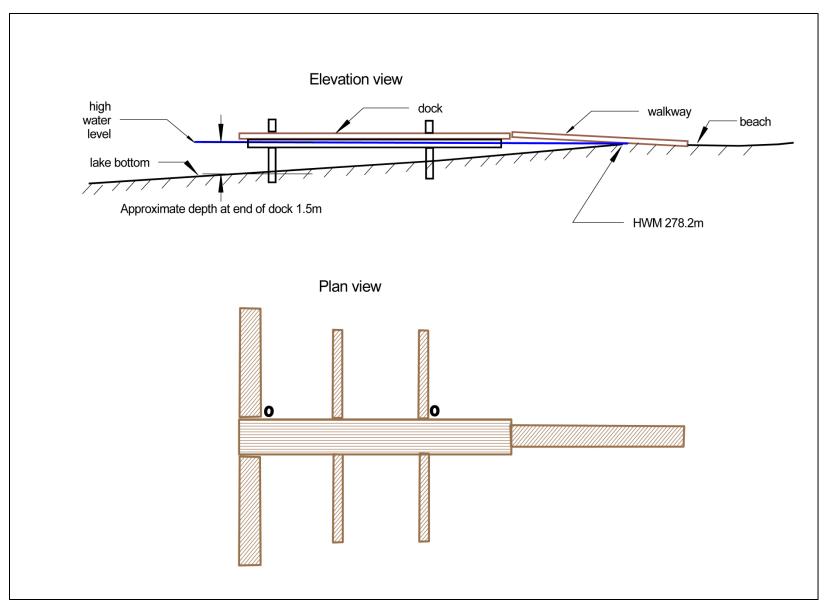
Elevation and plan view of proposed new dock at Paradise Park.
